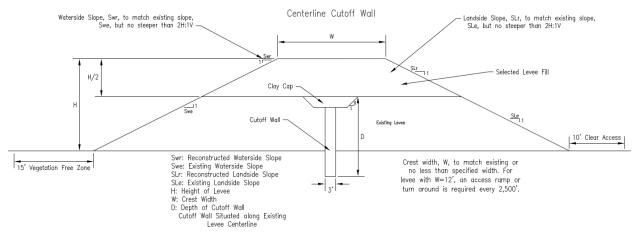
Template Option 2 – Centerline Cutoff Wall
